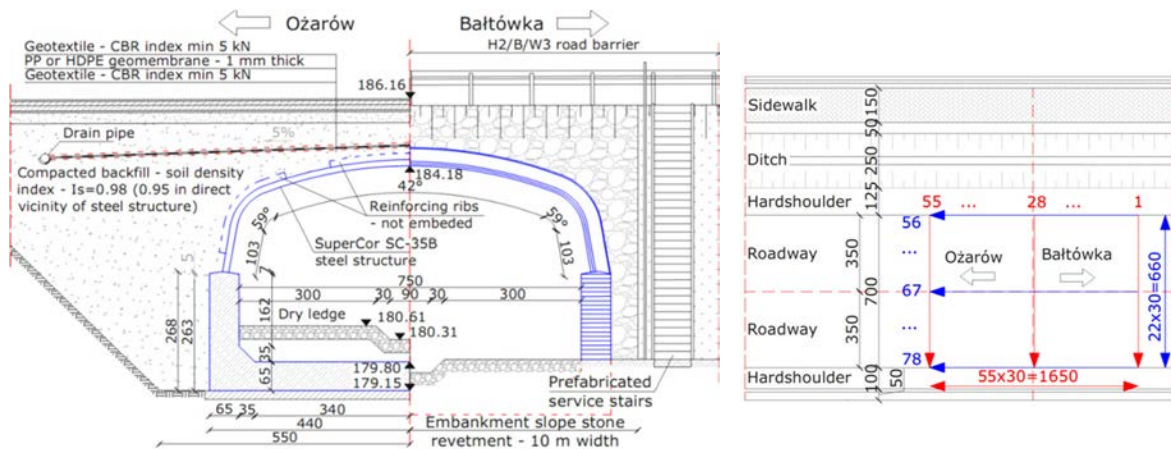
(a) Longitudinal cross-section of the culvert; (b) road layout with measurement scheme.
